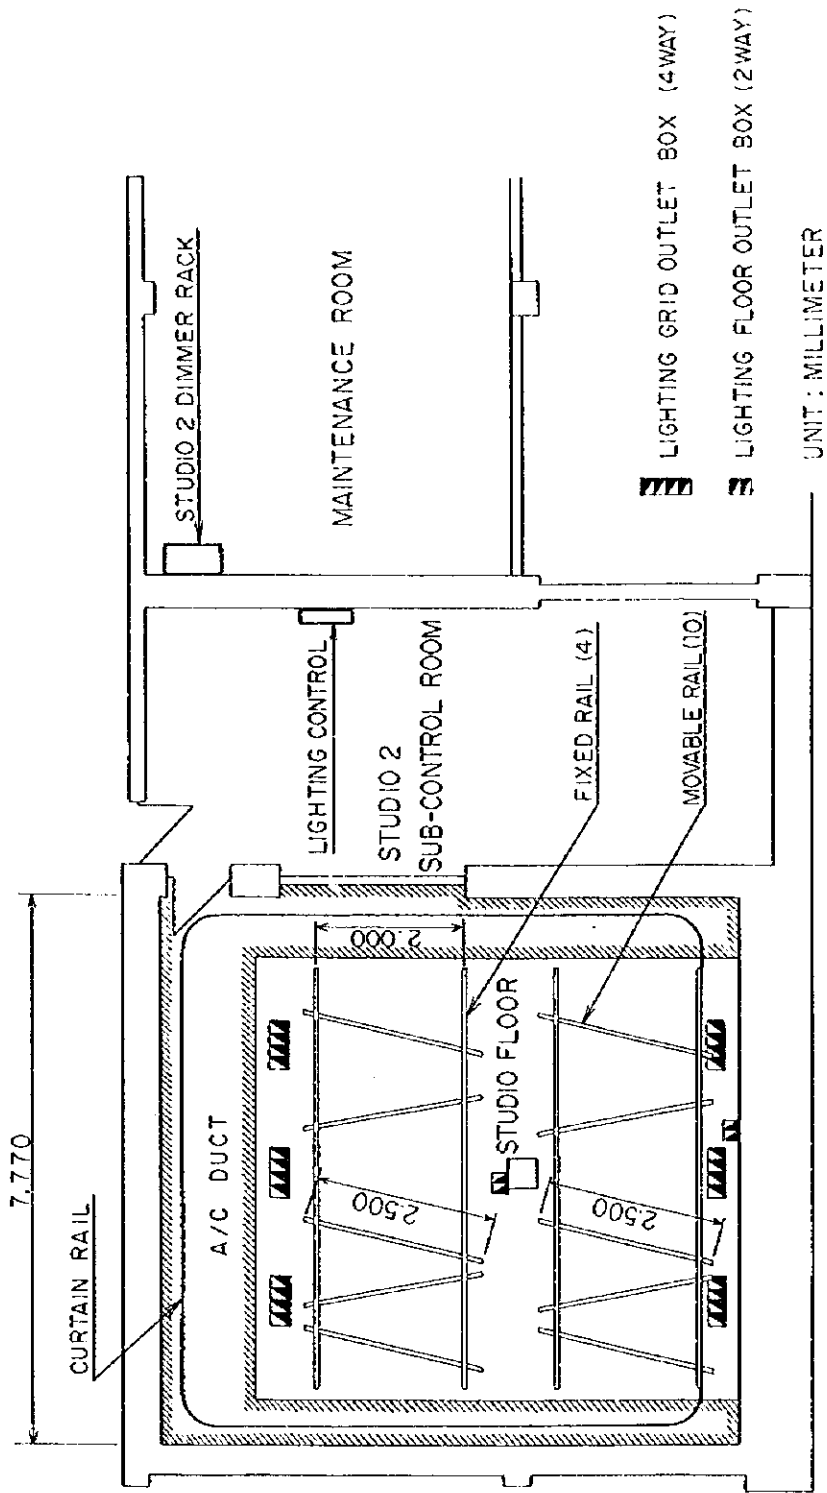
Equipment Layout of Studio 2 Studio Lighting
